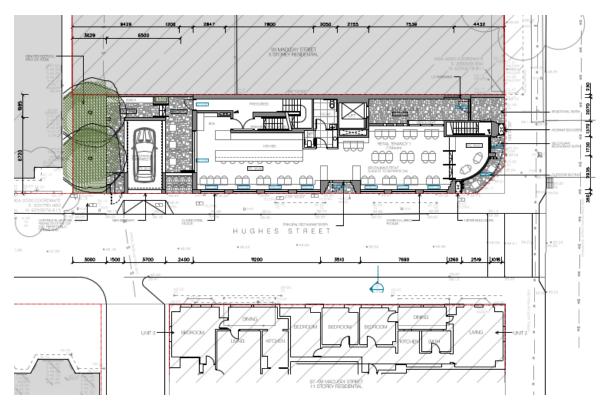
Plan illustrating separation between the subject site and 97-99 Macleay (Byron Hall)
